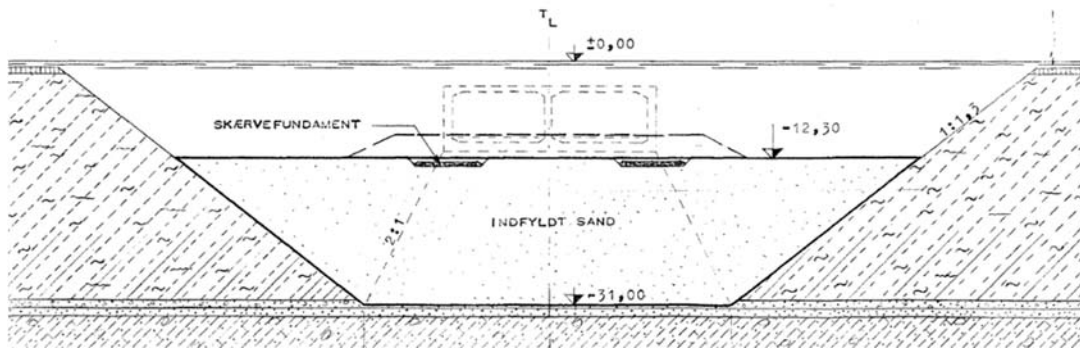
Cross section in tunnel trench where gyttja was replaced by a sand filling.
